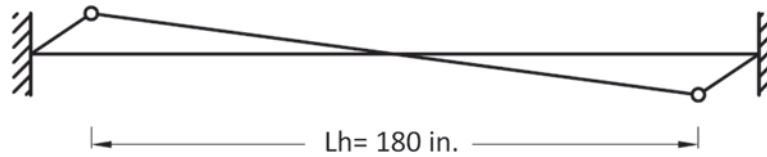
Specimen 2L: Pinned-Pinned Column Configuration after Cyclic Test
